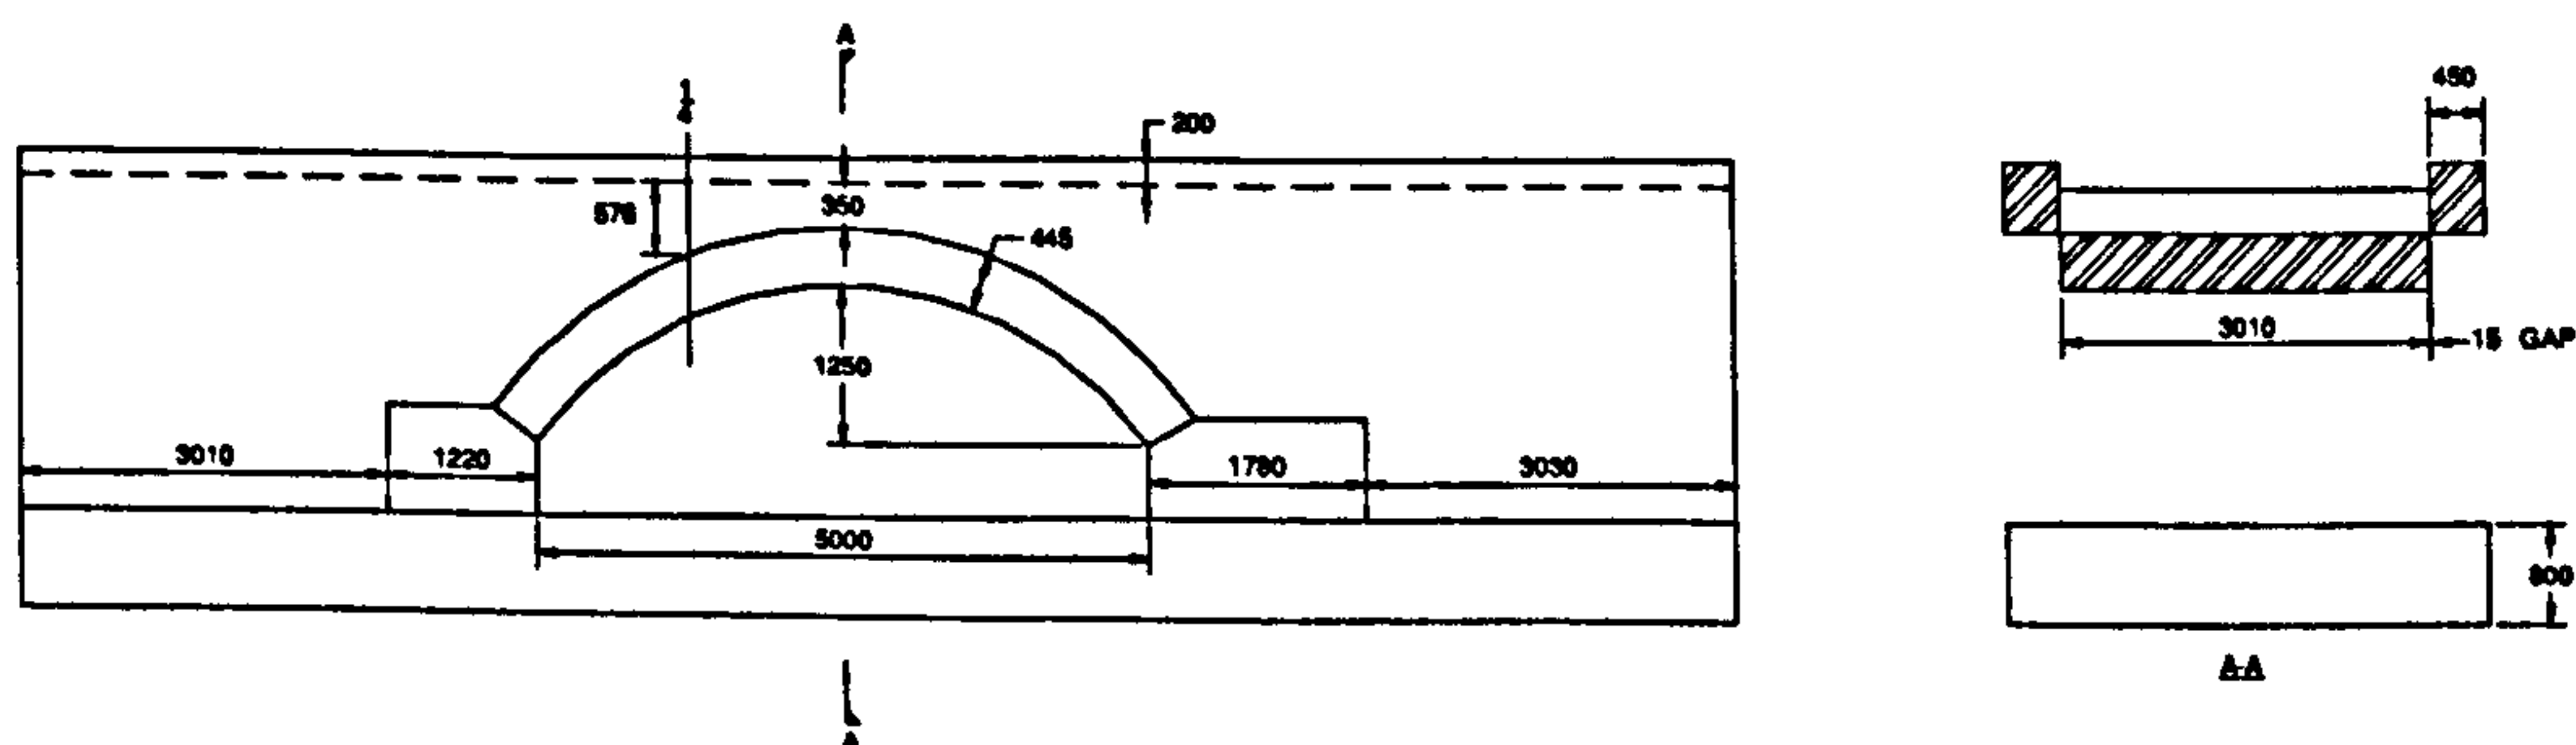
Bolton Institute tests: 5 m span bridge dimensions
